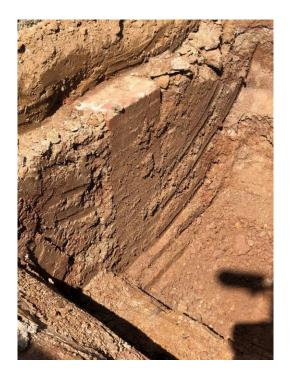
Redbrick foundations with intact step down brick formation, 2 m below carpark surface
